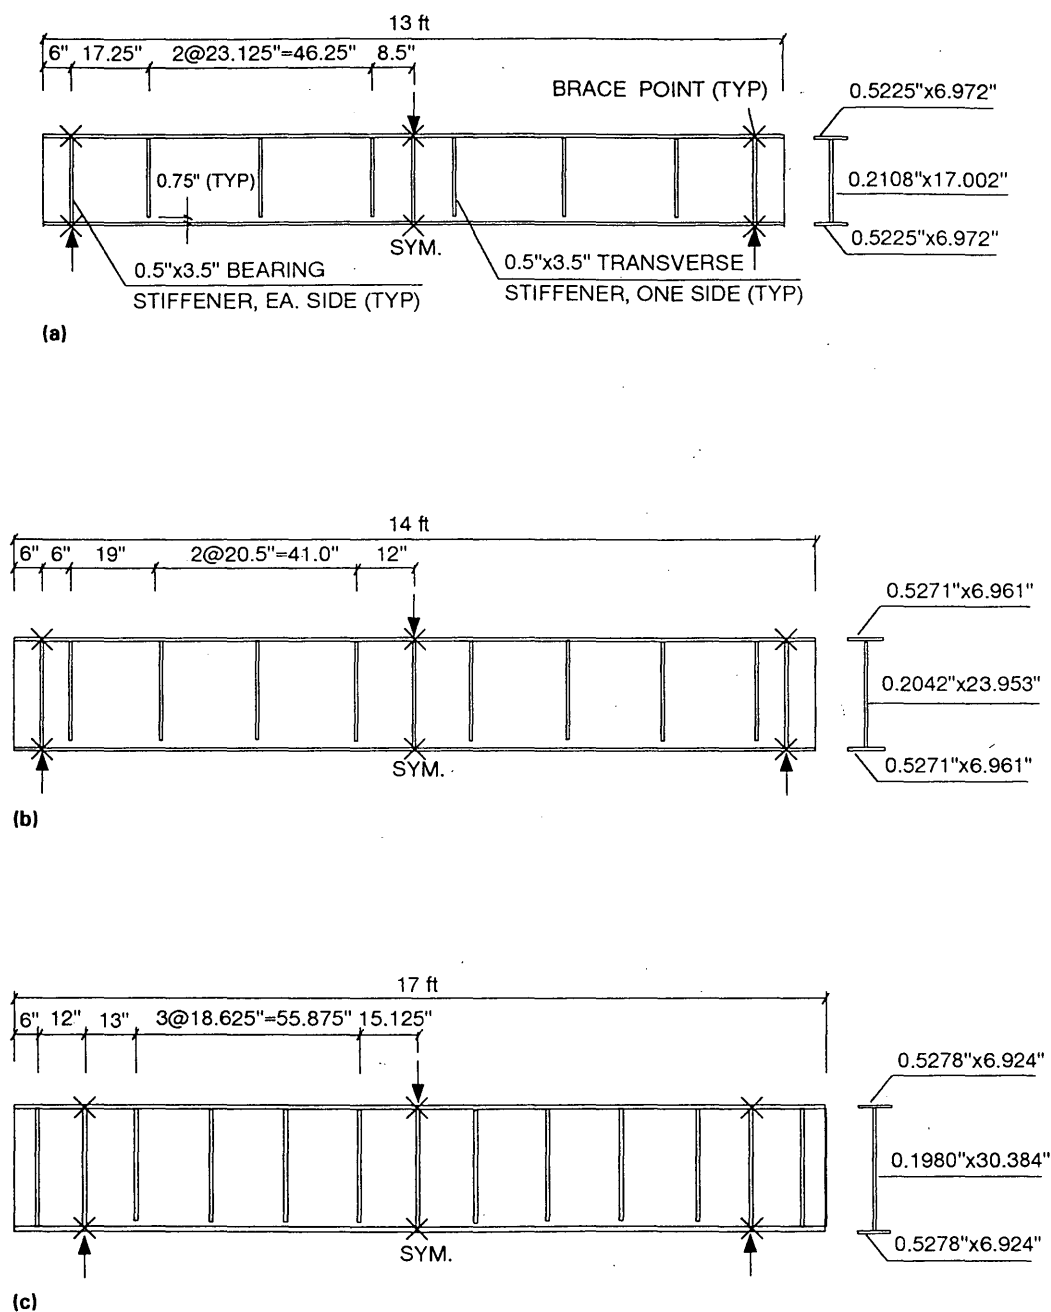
All-steel test specimens (4): (a) Specimen S, (b) Specimen M, and (c) Specimen D.
